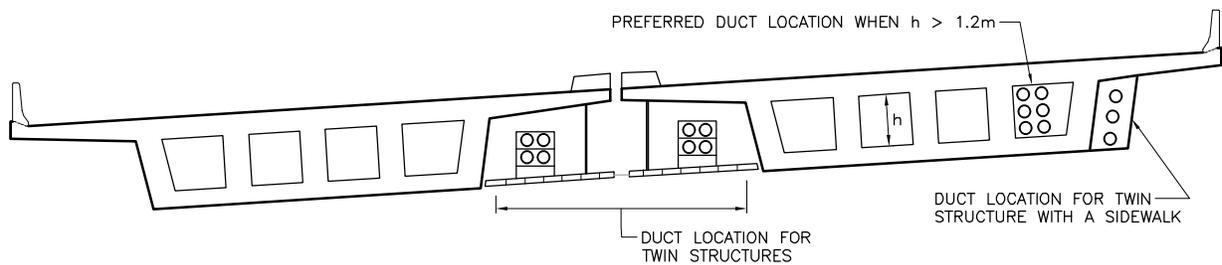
Post Tensioned Decks with Trapezoidal Voids
